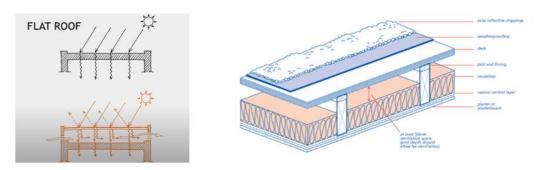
Greek demo. Scenario 3. Ventilated roof
